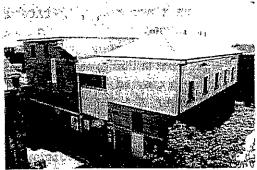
South-west elevation Hospital (left) and the Bathroom and Morgue (right) - part of drawing (DPW&S Plan Room PC 321/9)
